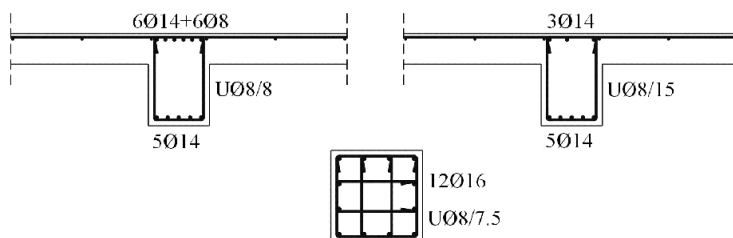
Adopted reinforcement: beam-support, beam-field and column
